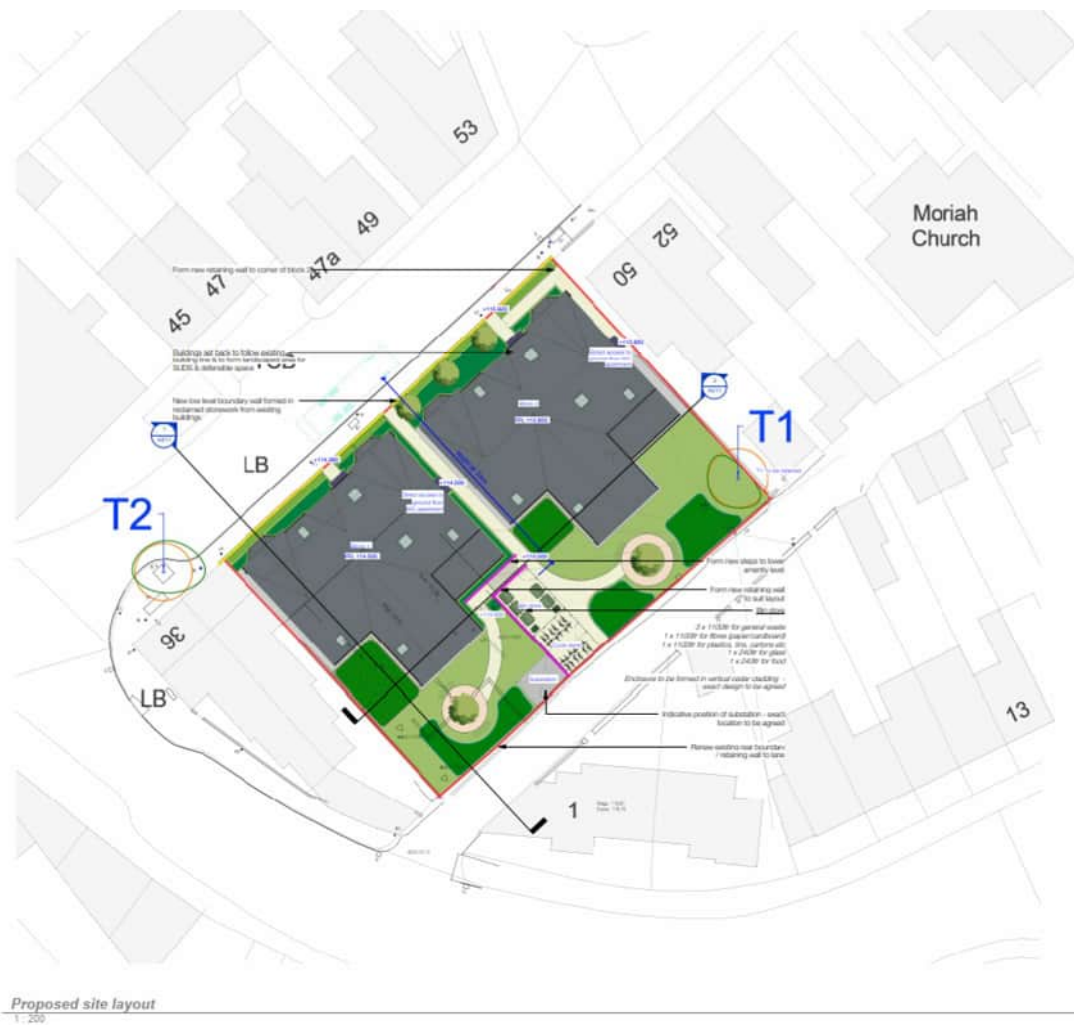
Proposed Site Plan - A003 Proposed Site Layout
